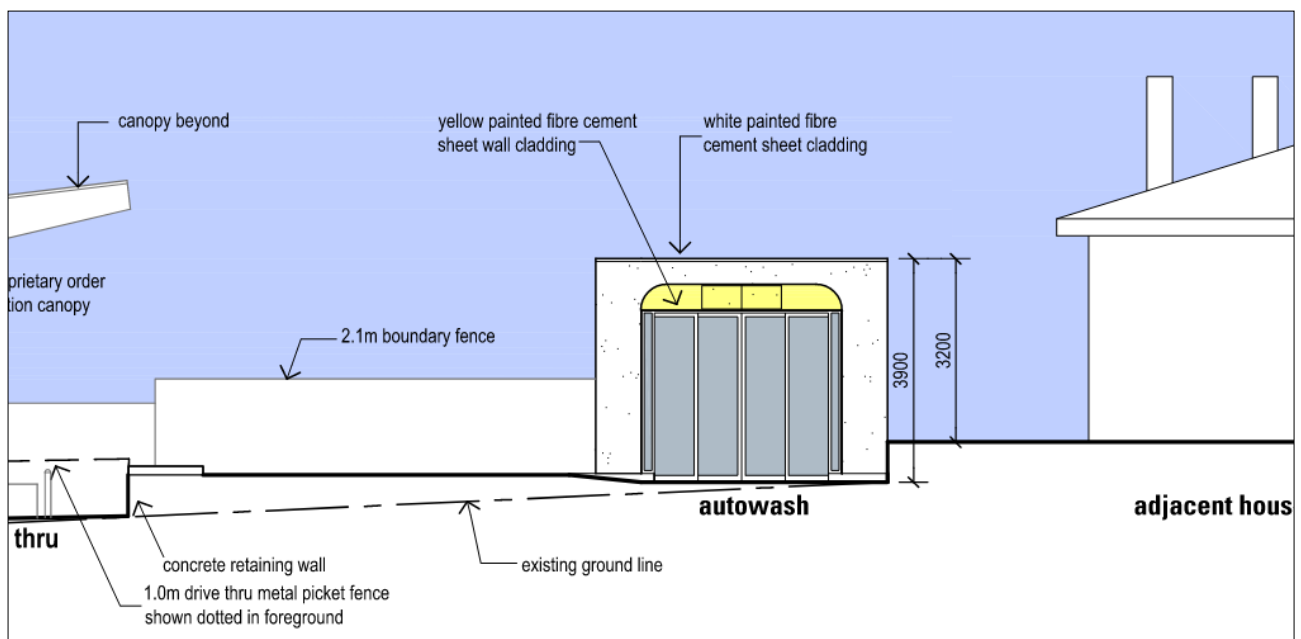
Elevation showing carwash adjacent to adjoining residential property (Source: Ratio)
